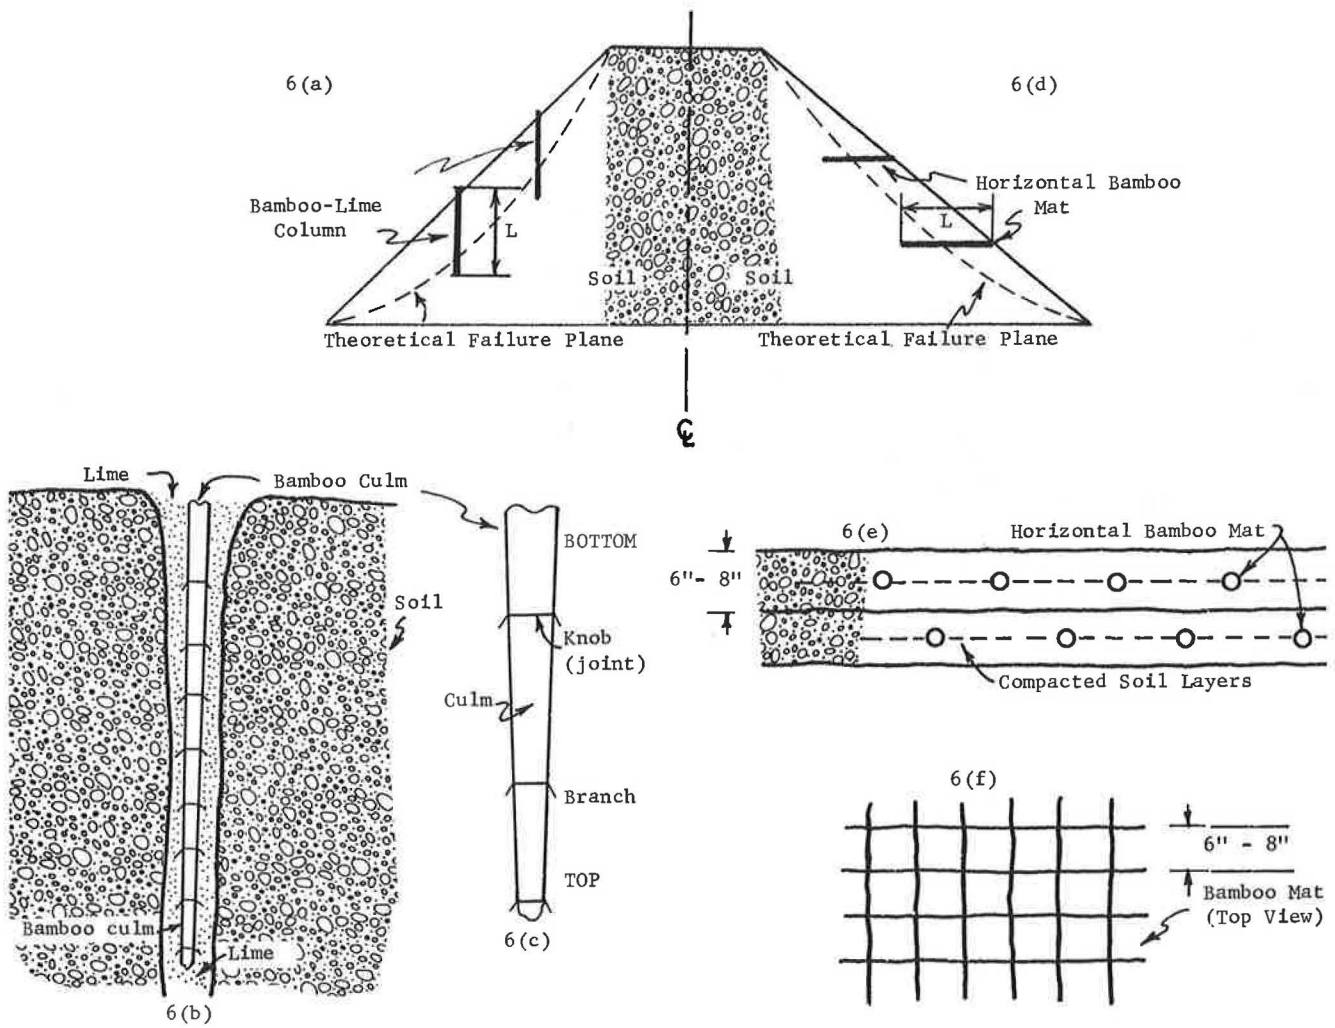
Proposed Field Installation Procedures for Bamboo Used as Reinforced Earth
